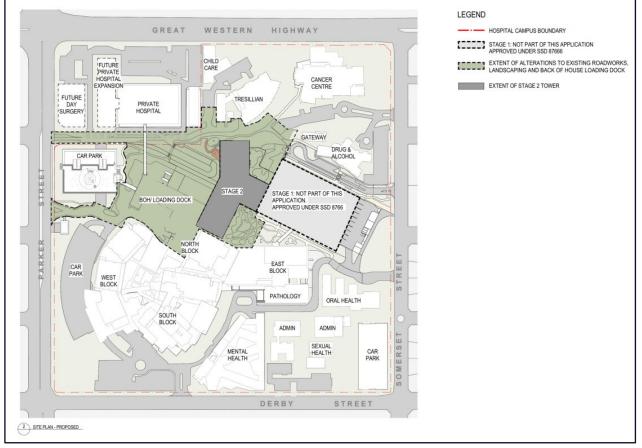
Proposed new site plan issued for the SEARs Application (source: BVN Architecture; Appendix B)
